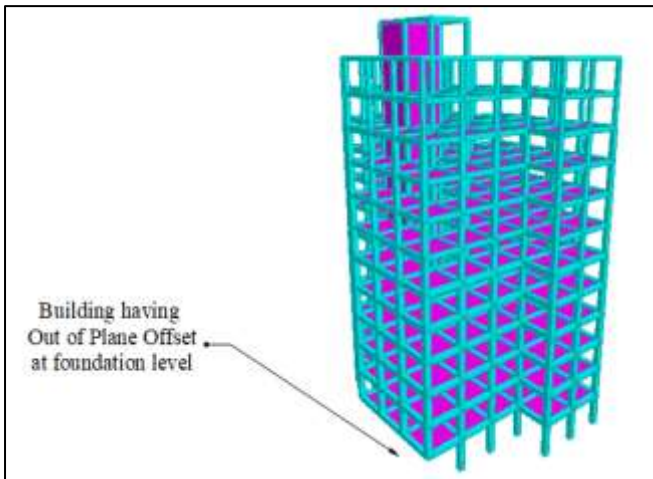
OPO Case 1 - Residential Apartment having out of plane offset provided at foundation level.
